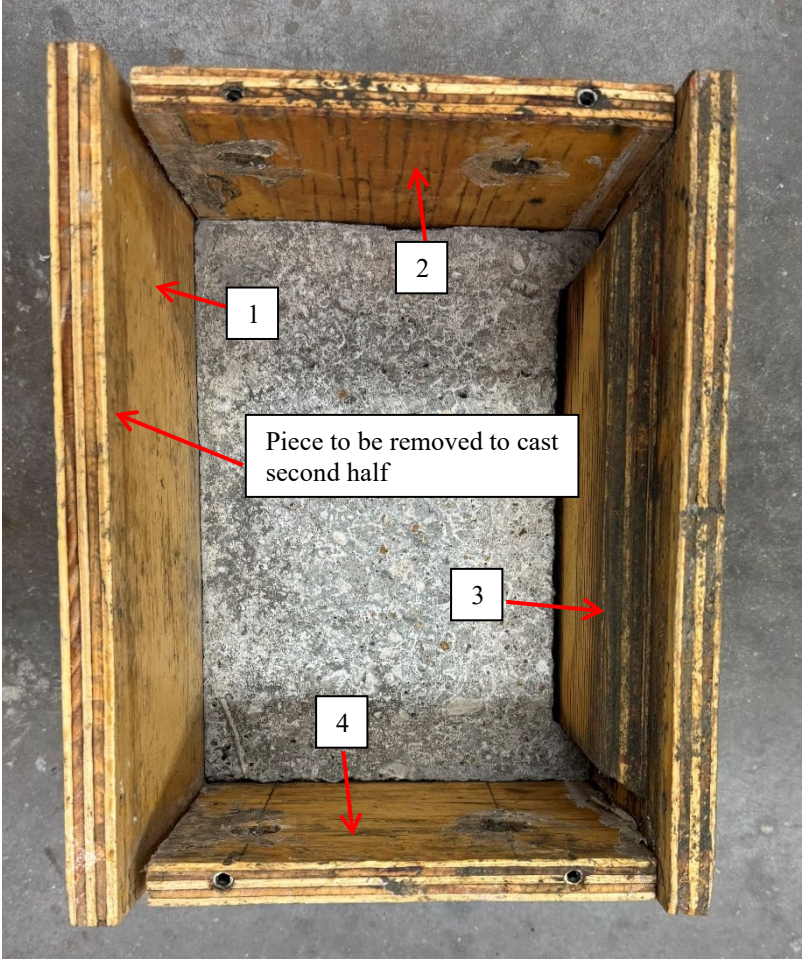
Formwork orientation after casting first half of post-crack specimen
